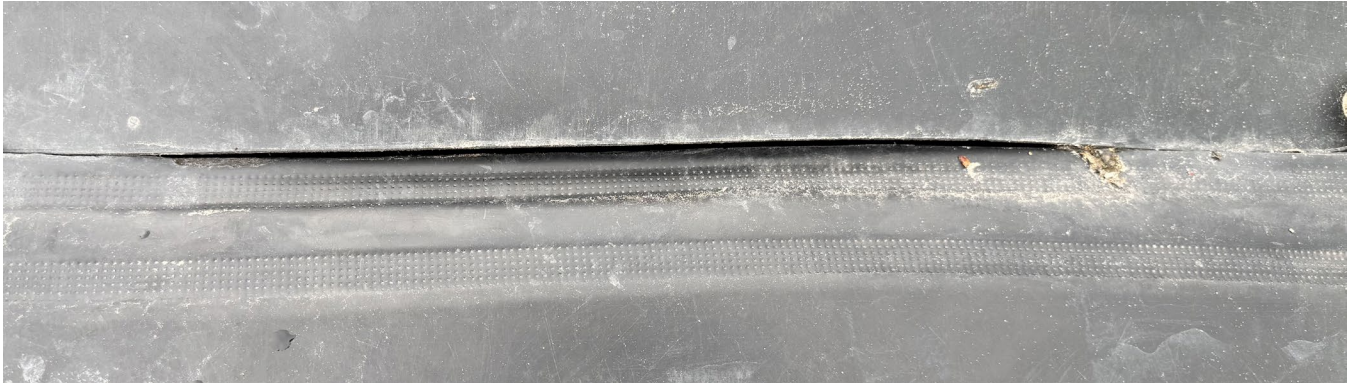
Stress cracking about ten years after welding adjacent to poor weld that passed all standard tests
